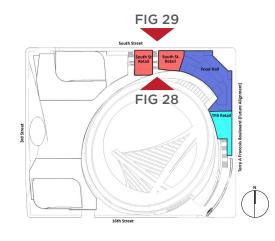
| SOUTH ST RETAIL AND GARAGE - SOUTH ST ELEVATION
